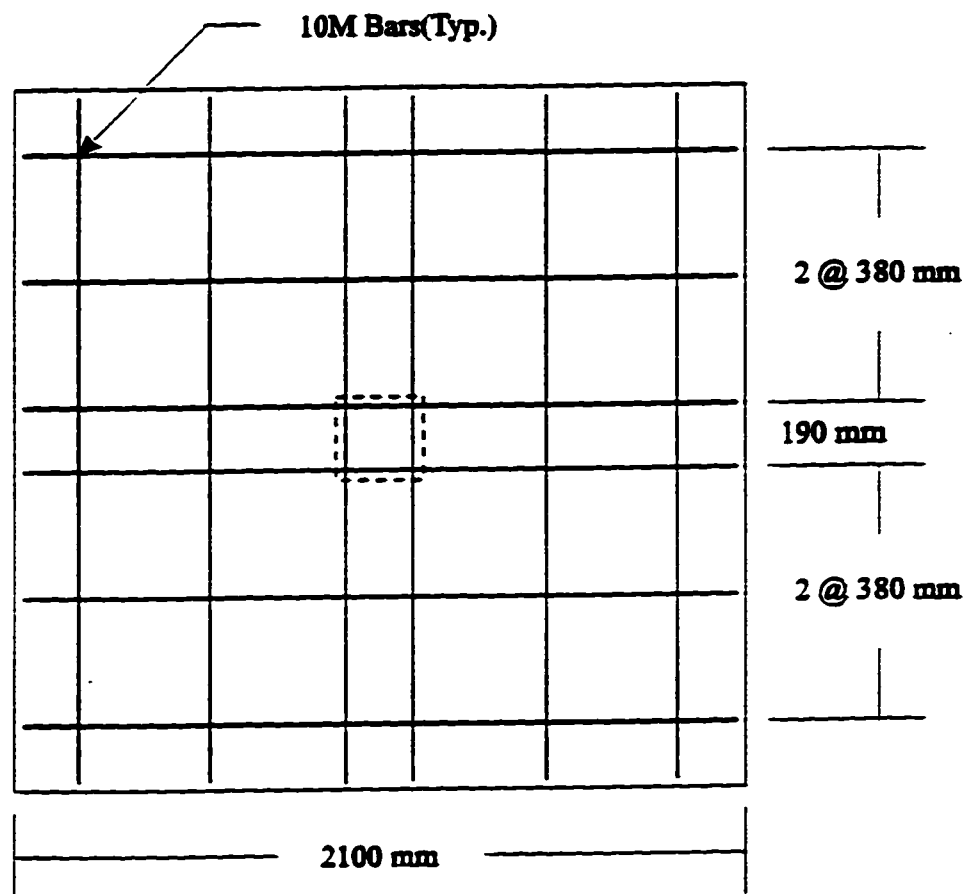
Typical Bottom Mat Reinforcement Layout
